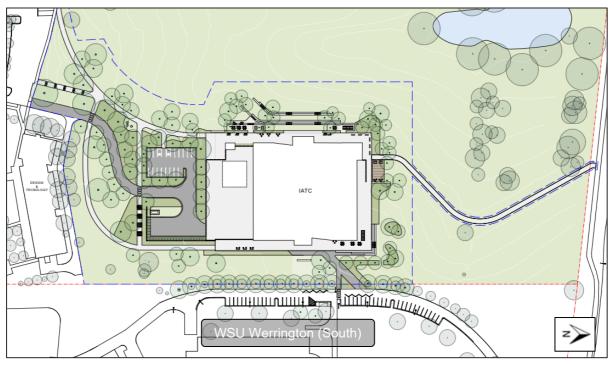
| Proposed IATC site layout (Source: Applicant's RtS)
